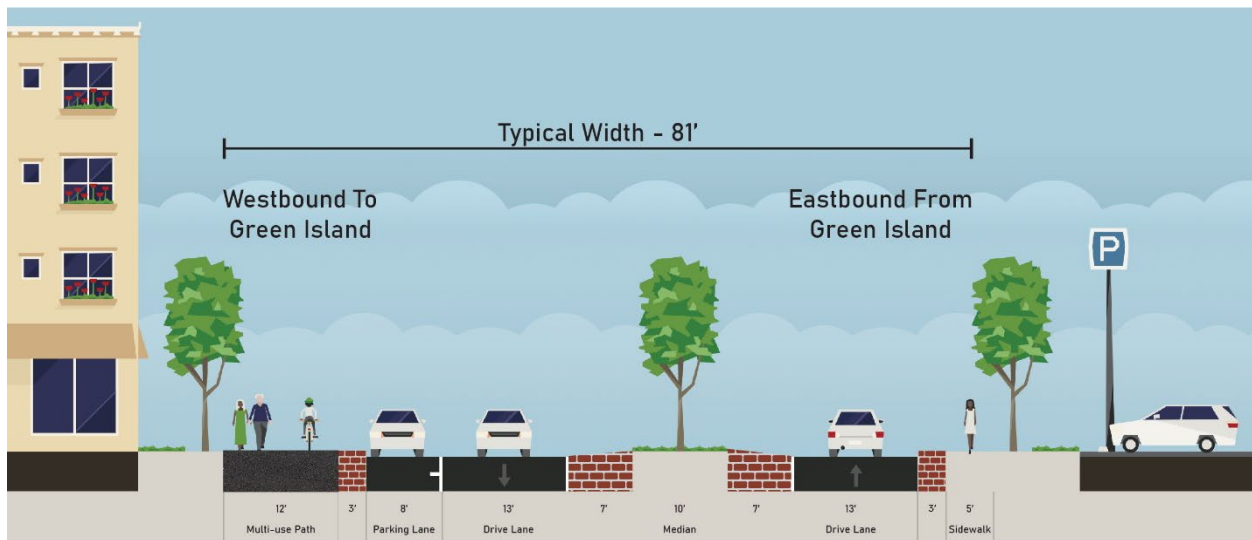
BUILD CONCEPT CROSS-SECTION
